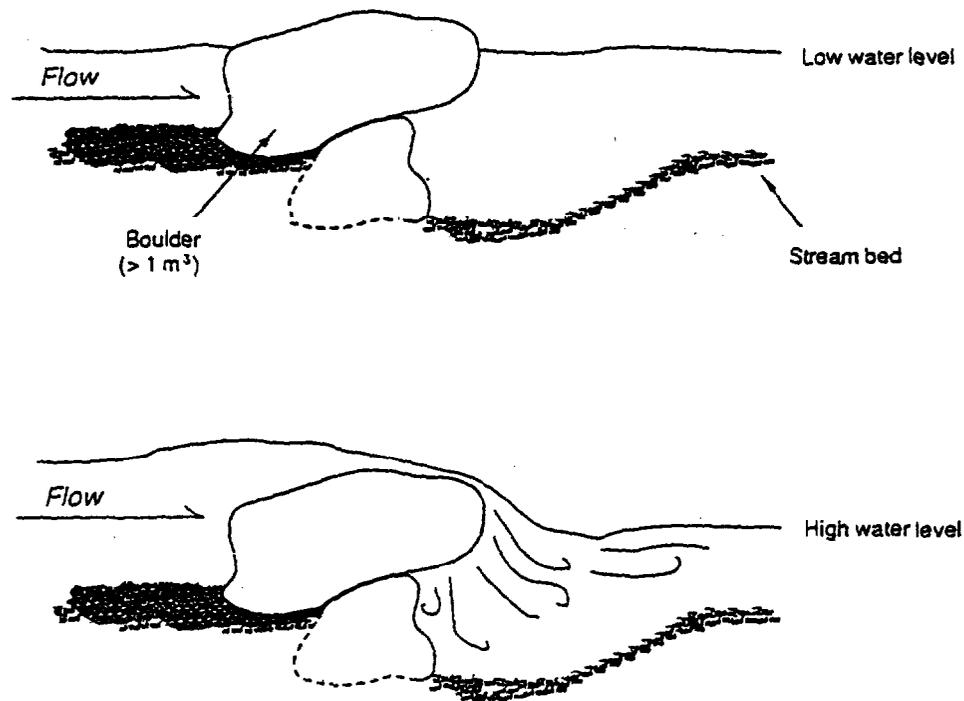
Schematic diagram of rock weir dam used to control water surface elevation and stabilize stream bed used in the Potters Pond enhancement project.
